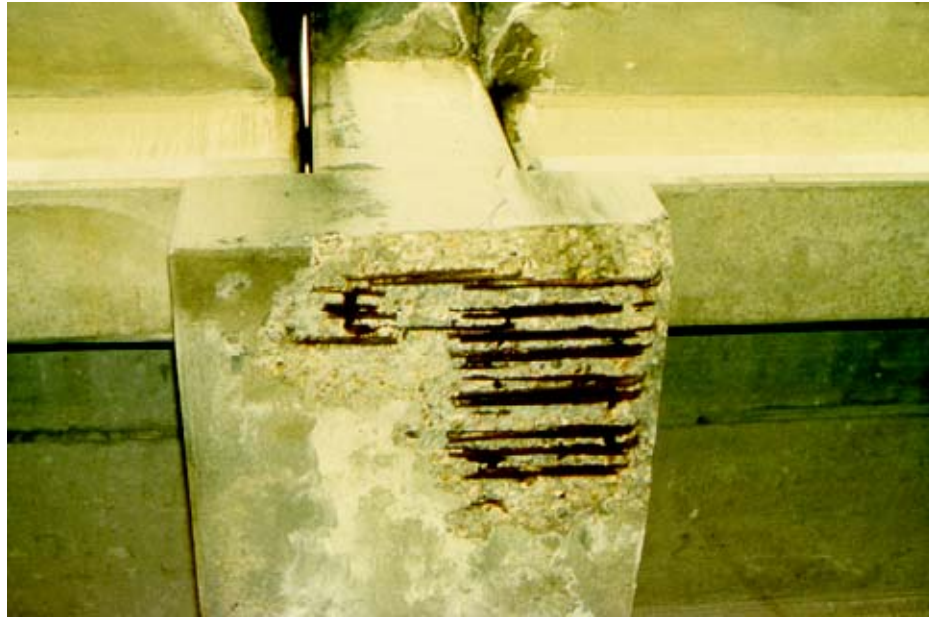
Corrosion Damage of Original Pierce Street Bridge
